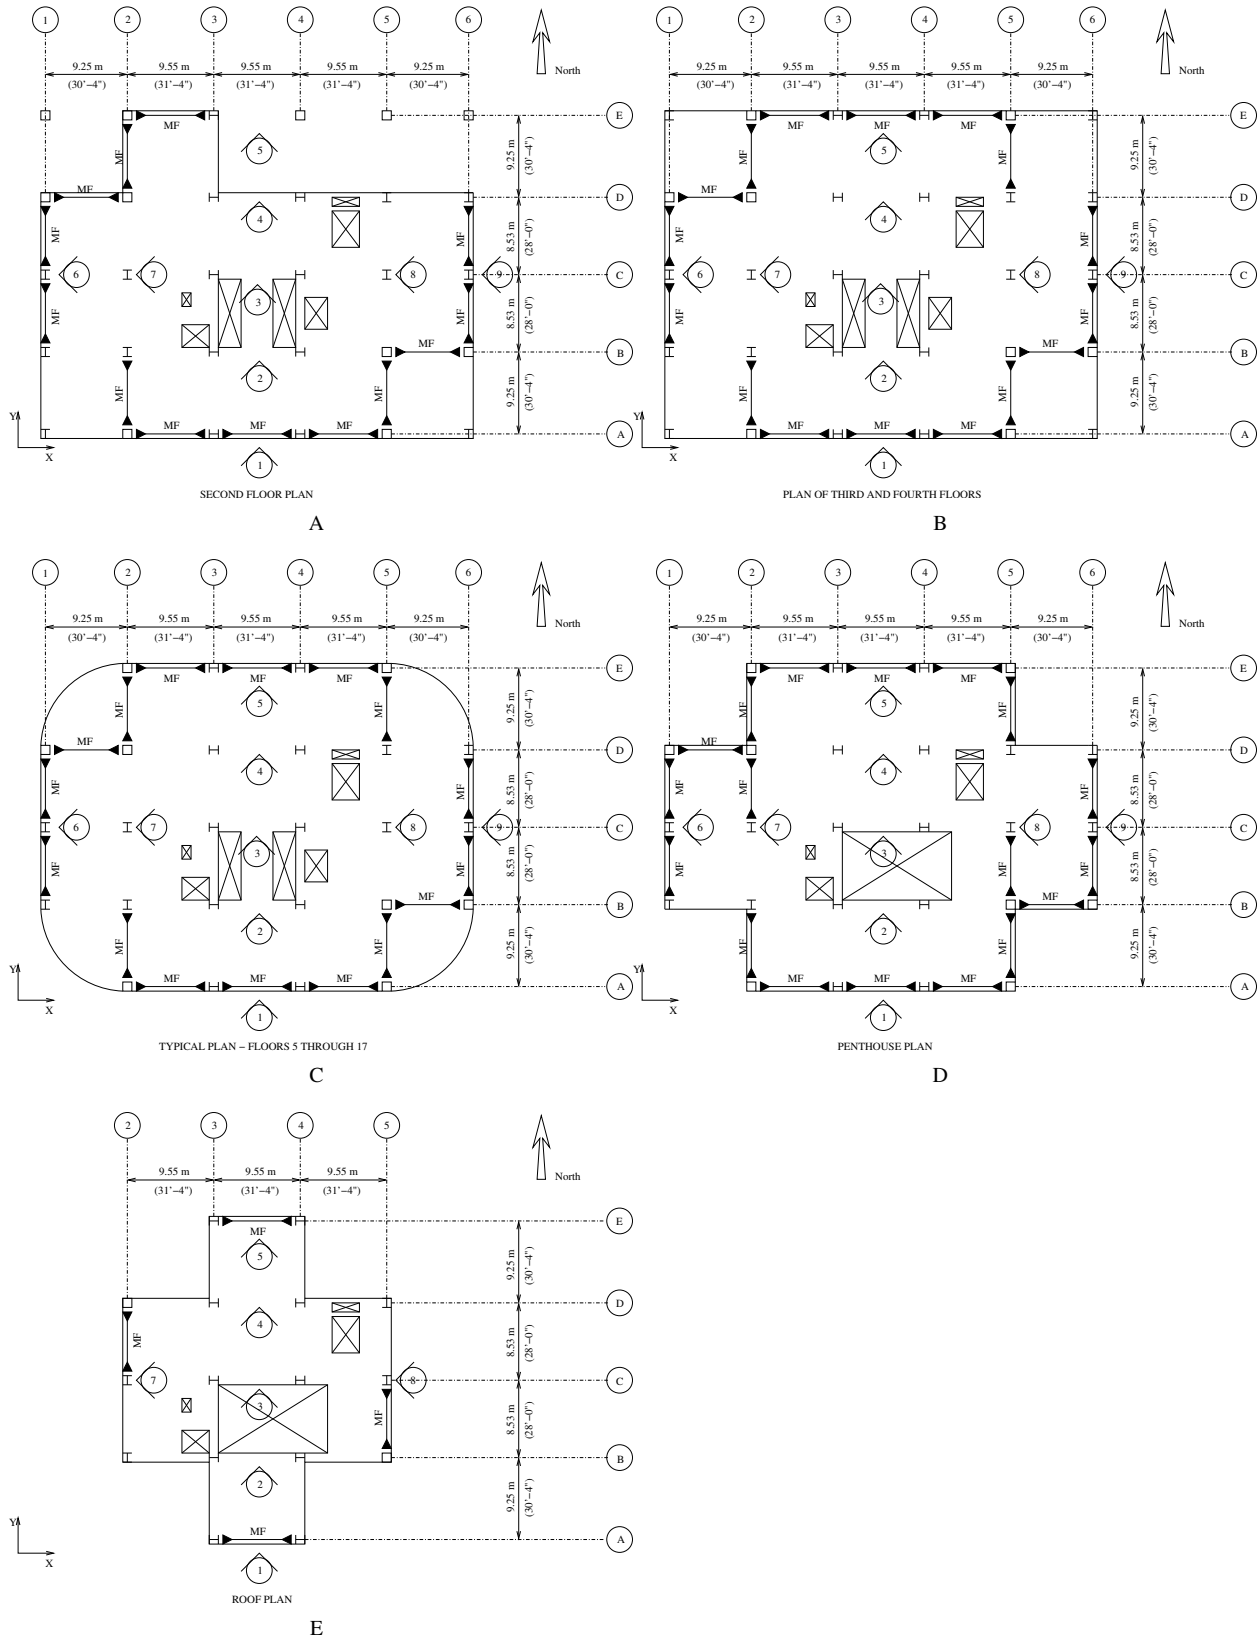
Plans of the redesigned building showing the location of columns and moment-frame (MF) beams (the frame elevations with beam and column sizes are given in Appendix C). Note the greater number of moment-frame bays in the redesigned building.
